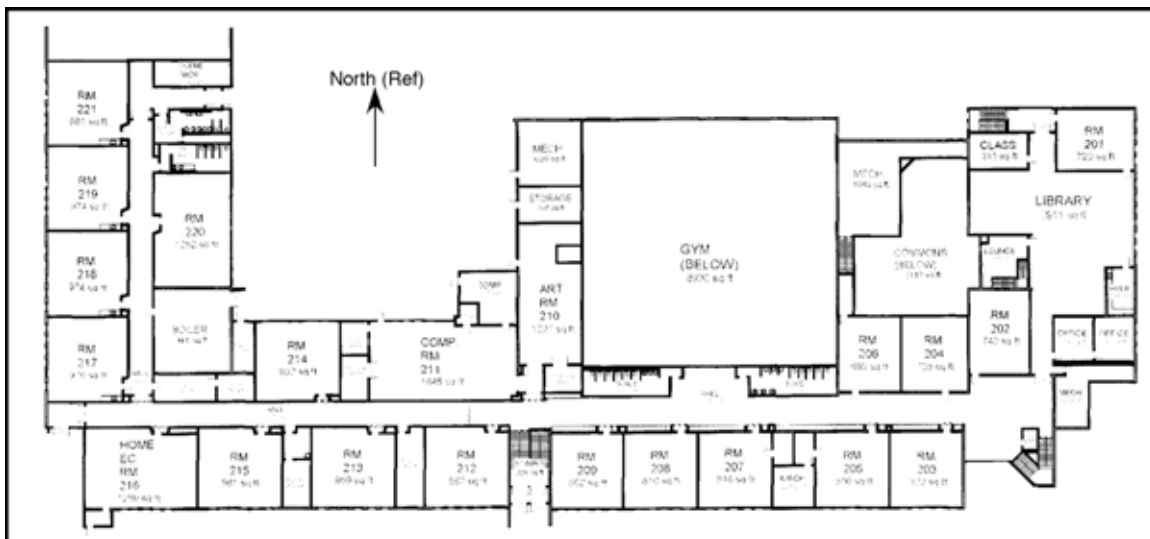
Plan of Upper Level – Gym and East Additions; and Original 1952 Building
